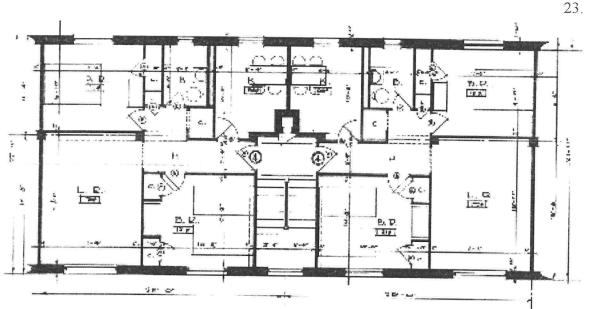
Ribbon plan *Unit Plans*, HD-29.
